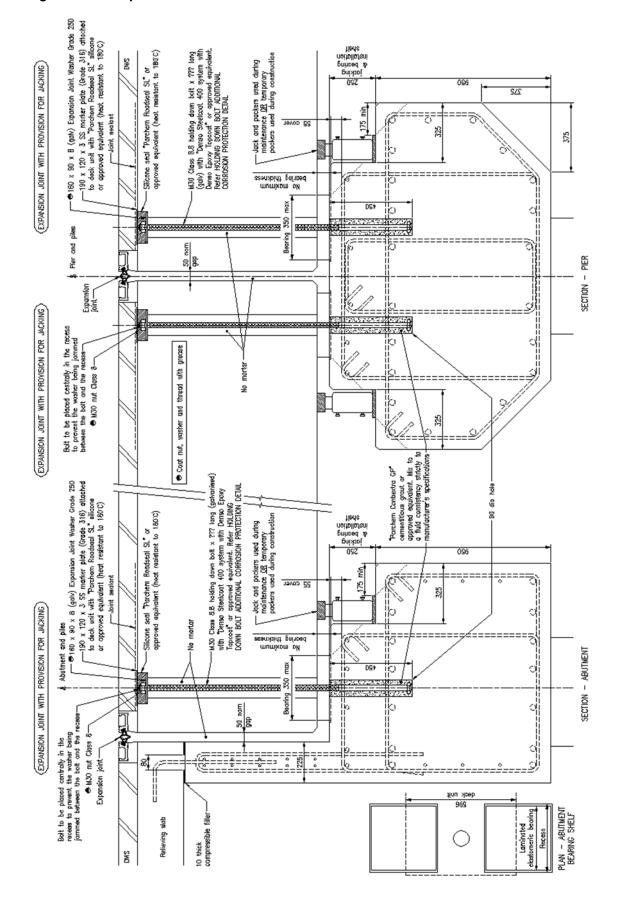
Expansion Abutment and Pier Joints – DWS on Deck Units
